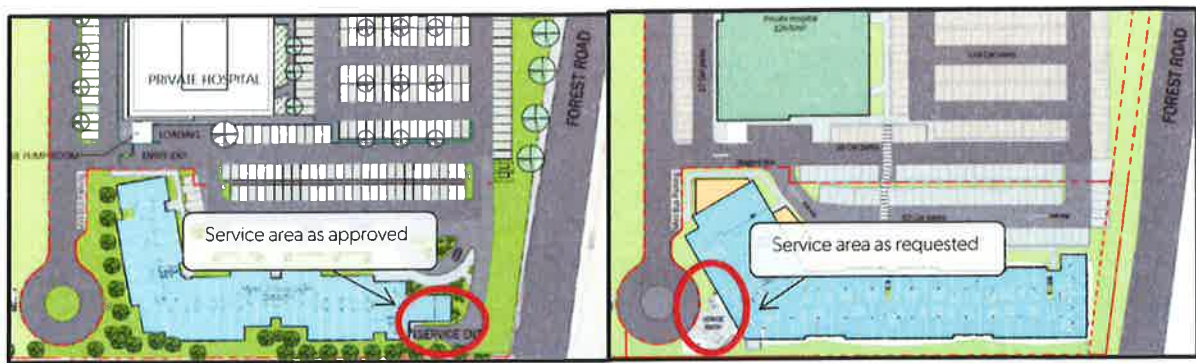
| Medi-Motel site arrangement as approved (left) and proposed (right)
